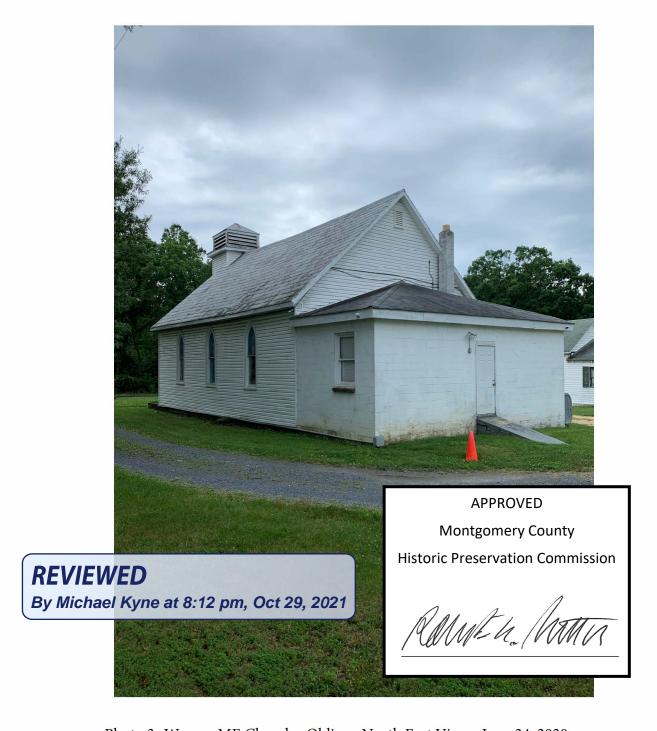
Warren ME Church - Oblique North East View - June 24, 2020
